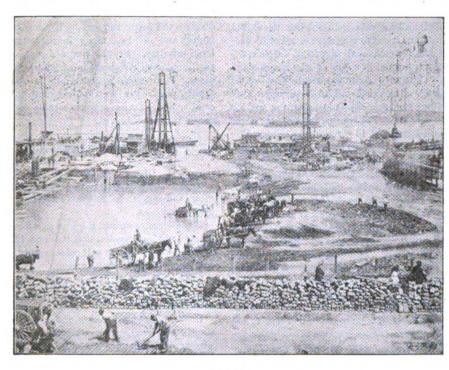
View of Power House Site, Ninety-sixth Street and First Avenue.
